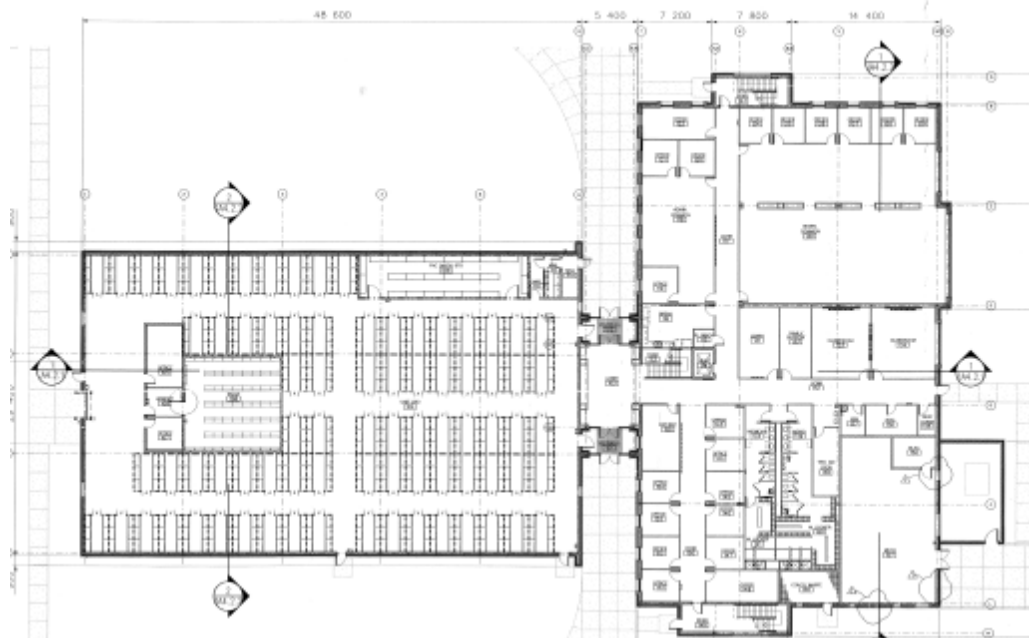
Army Reserve Center floor plan, Bldg 3450, Fort Carson, CO.
